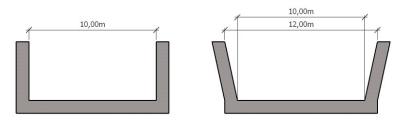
Cross-section tunnel straight walls(left) and walls under a slope(right) (SketchUp)
